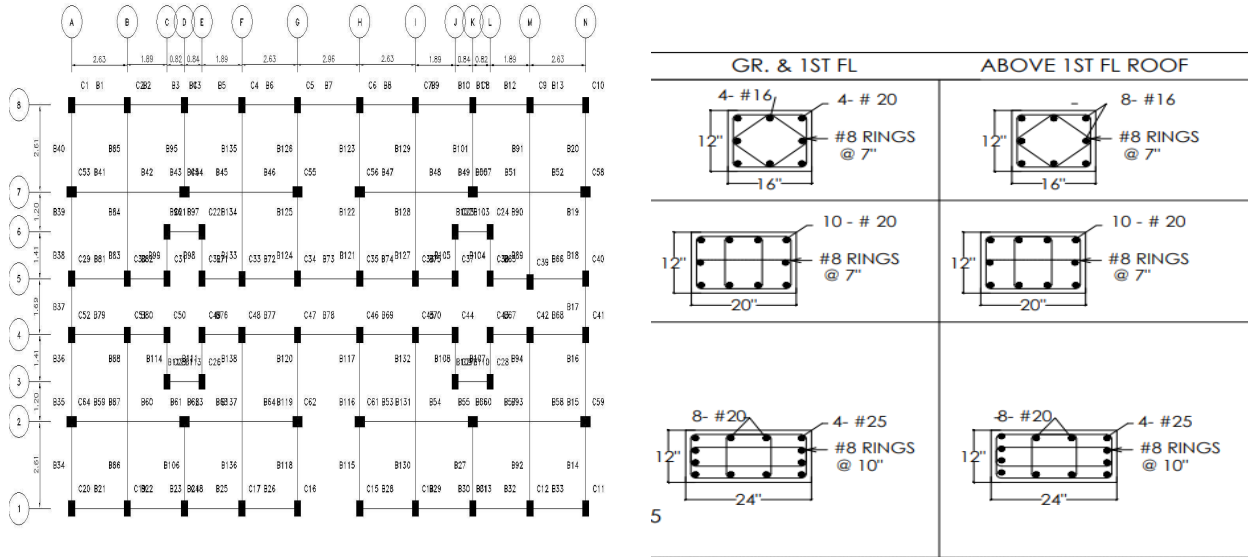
(a): The columns position, sizes, (b) Reinforcement details, in ground and floors
